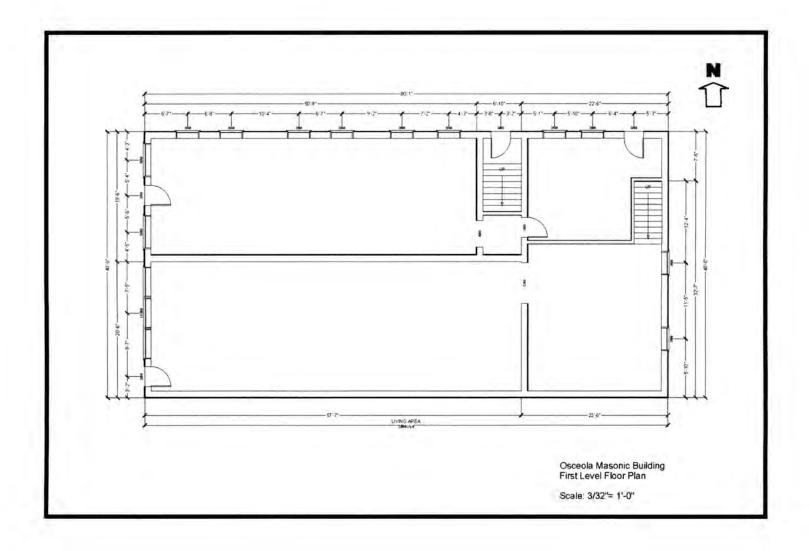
First Floor Plan (Ryan Lundquist Plan, 2009)
